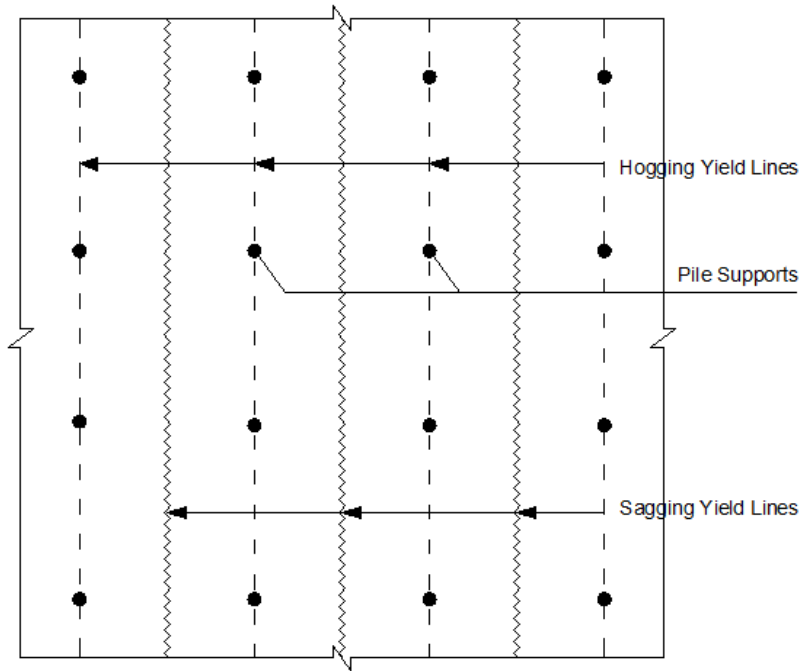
Schematic depiction of the wide beam failure mechanism in a pile-supported ground floor, as adopted from (Kennedy and Goodchild, 2003)
